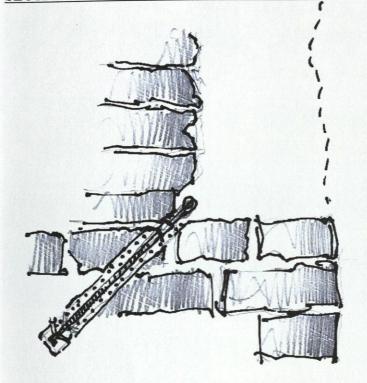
Field sketch of section detail at wall showing steel rod and toggle assemblage set into the mud brick wall.
